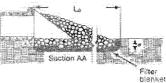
Riprap Outlet Design (North Carolina, 1993)
